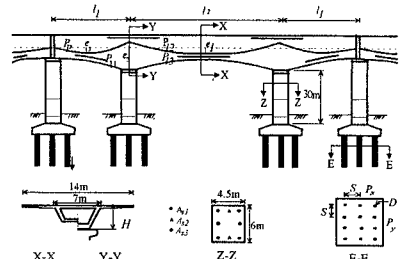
Design variables of three-span continuous prestressed concrete box girder bridge system
